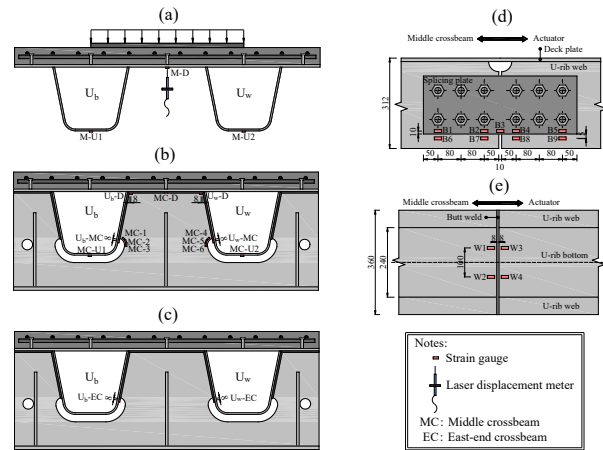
Instrumentation of specimen (unit: mm): (a) mid-span section of loading span; (b) section at middle crossbeam (MC); (c) section at east-end crossbeam (EC); (d) U-rib bolted connection; (e) U-rib butt-welded connection.
